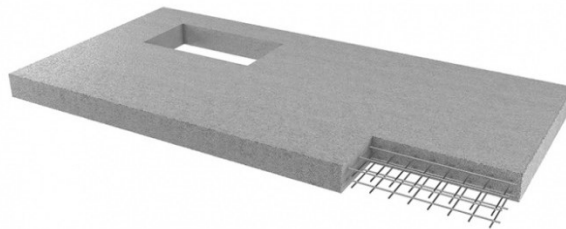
Reinforced concrete slab (Tuberías y Prefabricados Palau, S.A.¹⁹)
